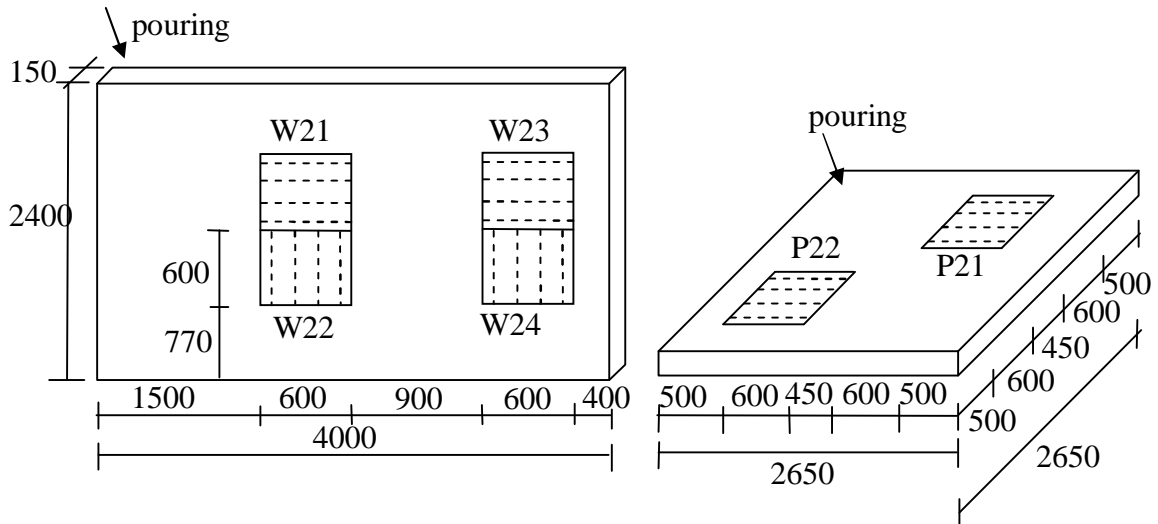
Elements sawn from wall W2 and slab P2 with SCC. Similar elements were sawn from wall W1 (W11, W12, W13, W14) and slab P1 (P11, P12) with VCC.
